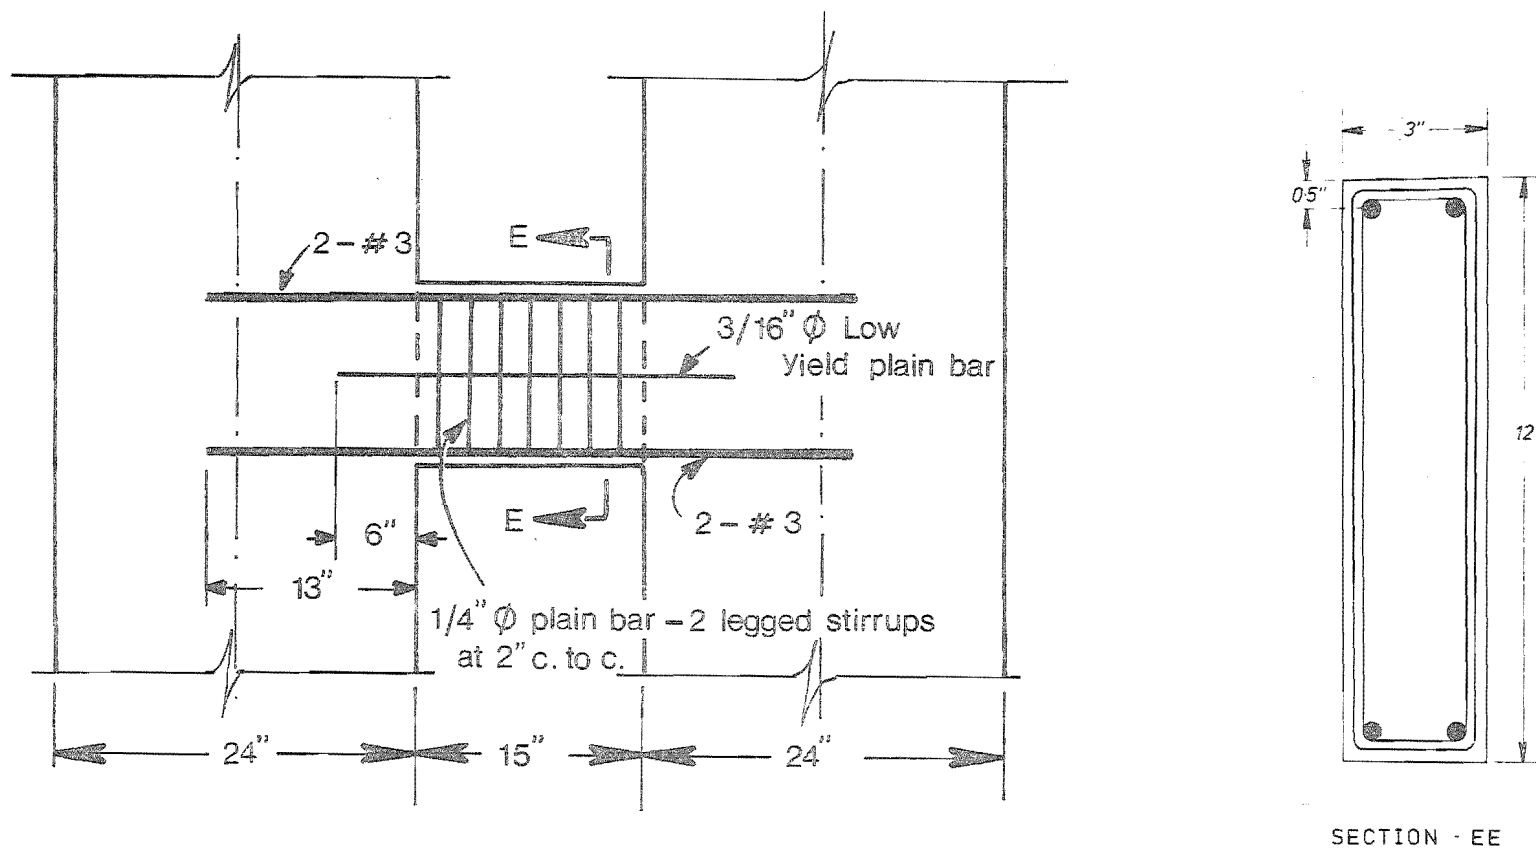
COUPLING BEAM REINFORCEMENT IN SHEAR WALL A
